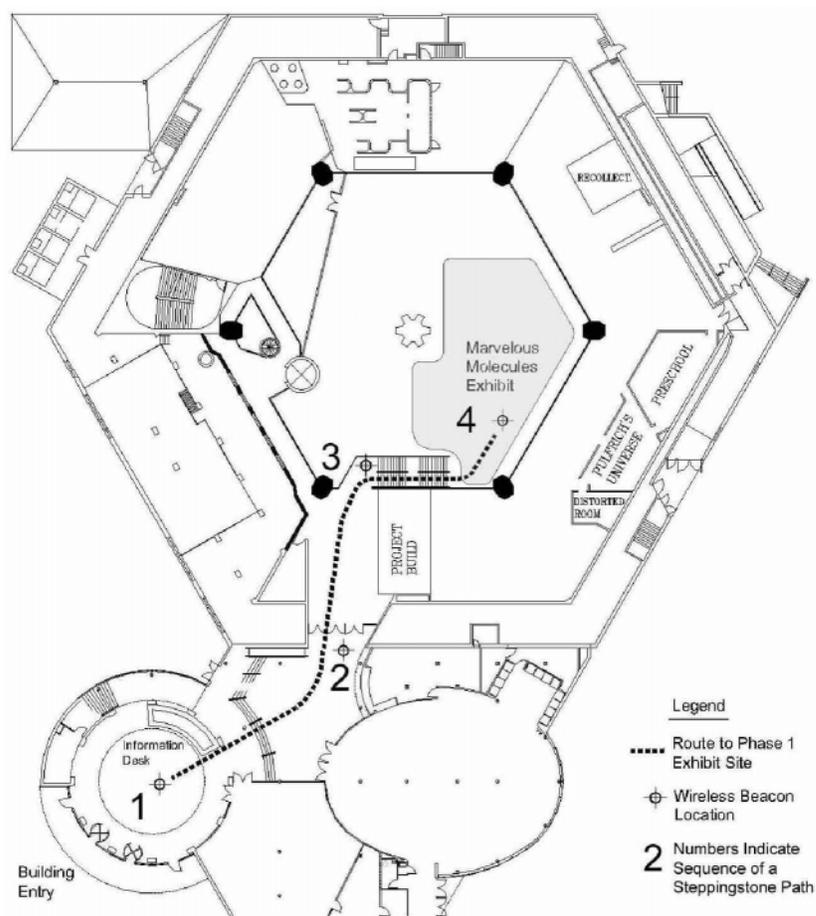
A plan of one floor of the New York Hall of Science, showing a travel route connecting the main information desk with the exhibit floor. The route included a “stepping-stone” path consisting of start and finish points and two way-points.
